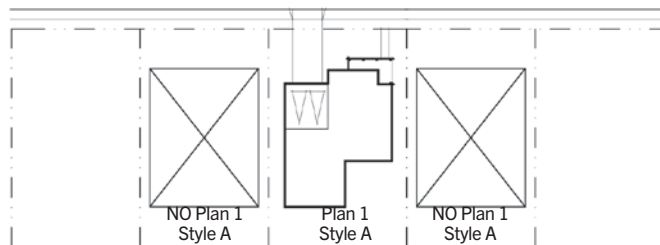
Plan and Elevation Diversity Diagram (SFD)
